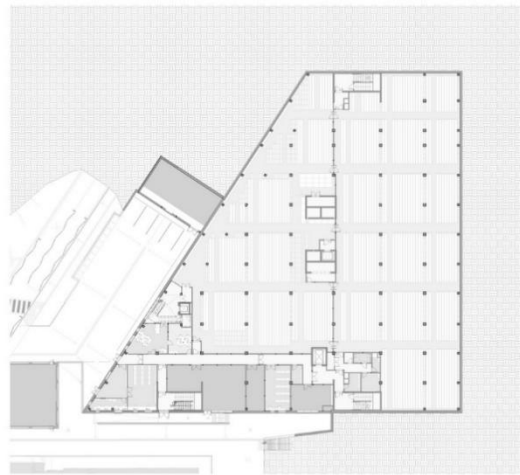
Basement Floor Plan of University of Birmingham's Library
